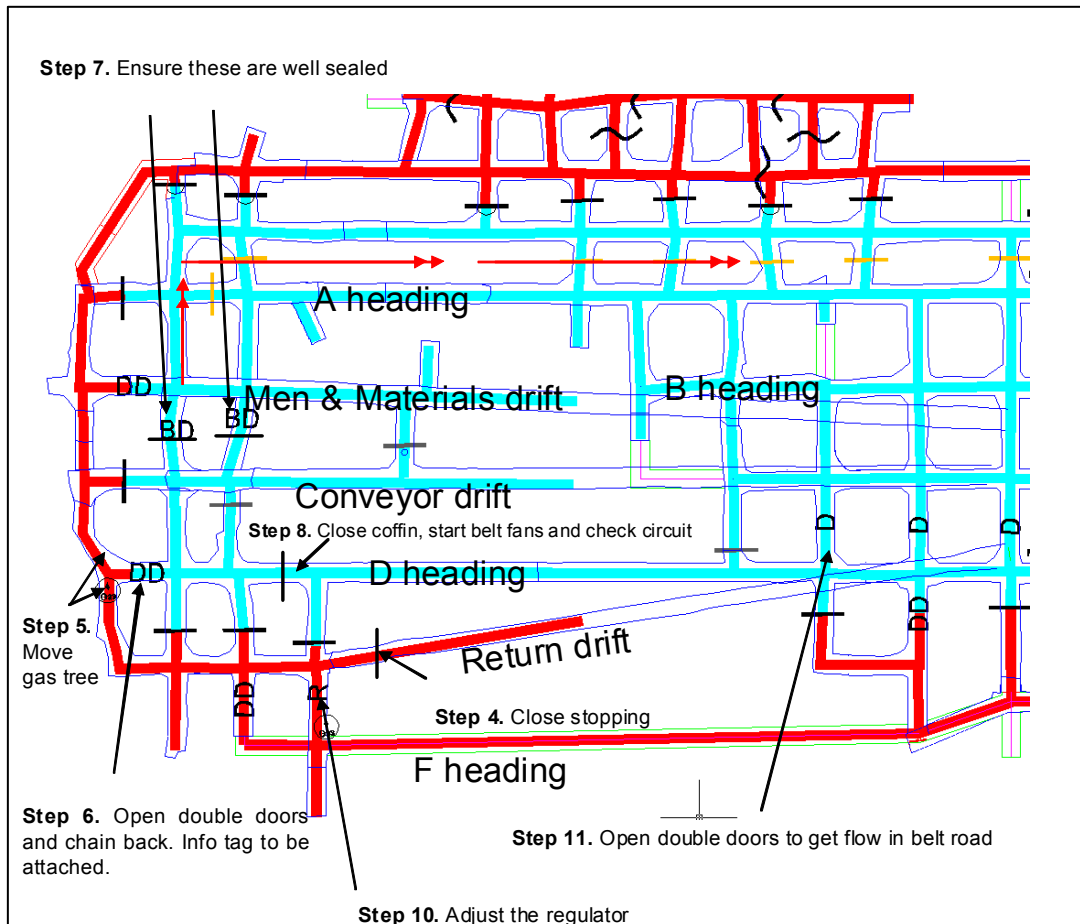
Plan detailing ventilation changes on stopping of the main fans
